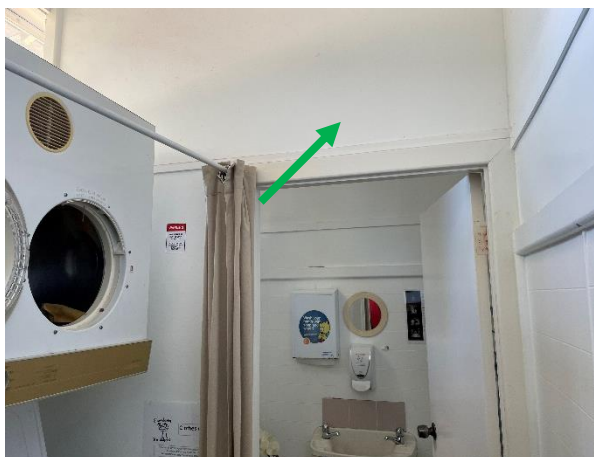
Main Building – non-asbestos containing fibre cement sheeting to the laundry partition wall
